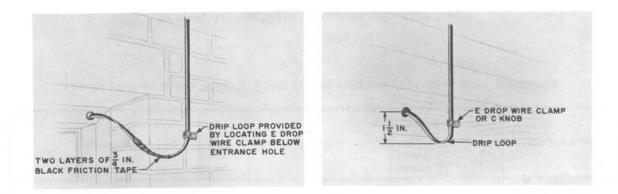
Last Attachment (Building Entrance Hole Does Not Slope Upward from Outside)
